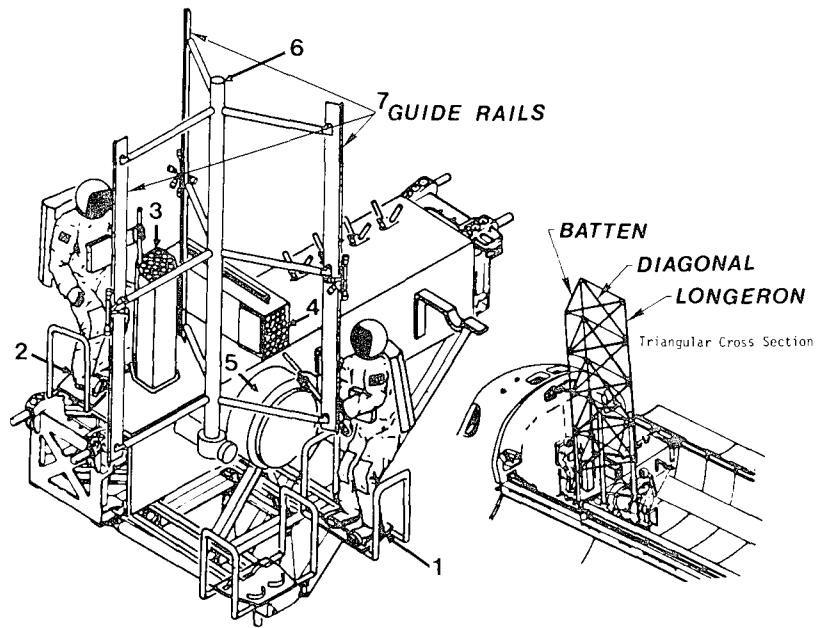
Schematic showing EVA construction of ACCESS truss on assembly fixture.
